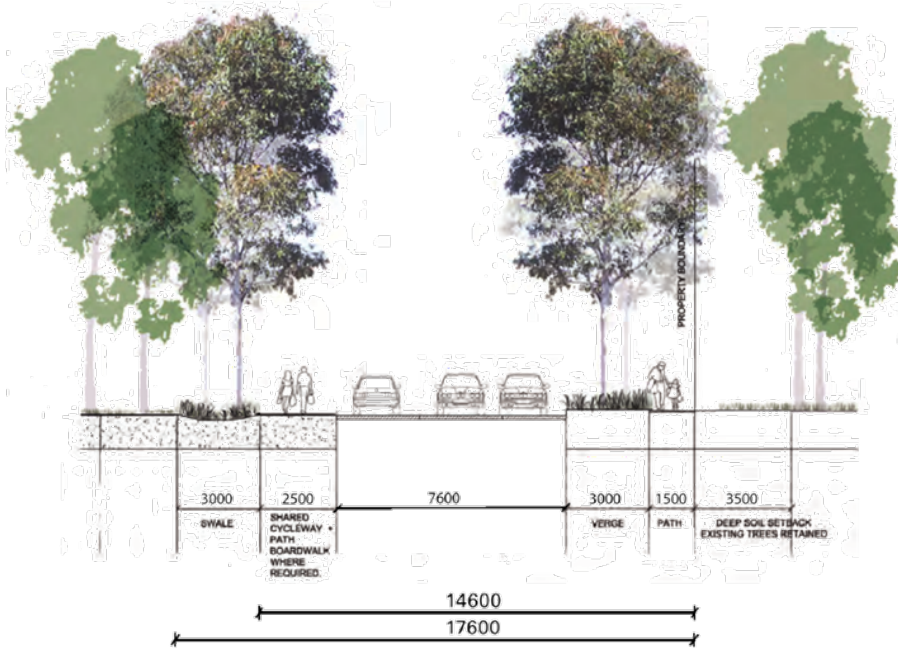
TYPE 9: LOCAL STREET WITH PARK
